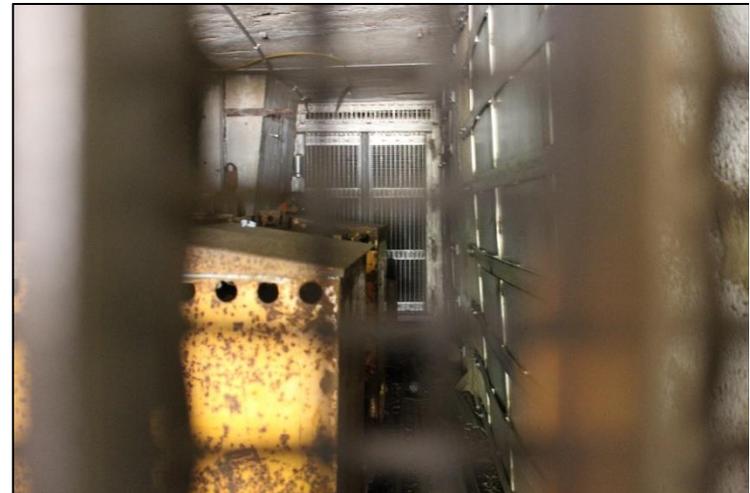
View of Anchor (Daly-Judge) Drain Tunnel entrance, through gate. Note additional modern gate and spalling concrete on ceiling.
